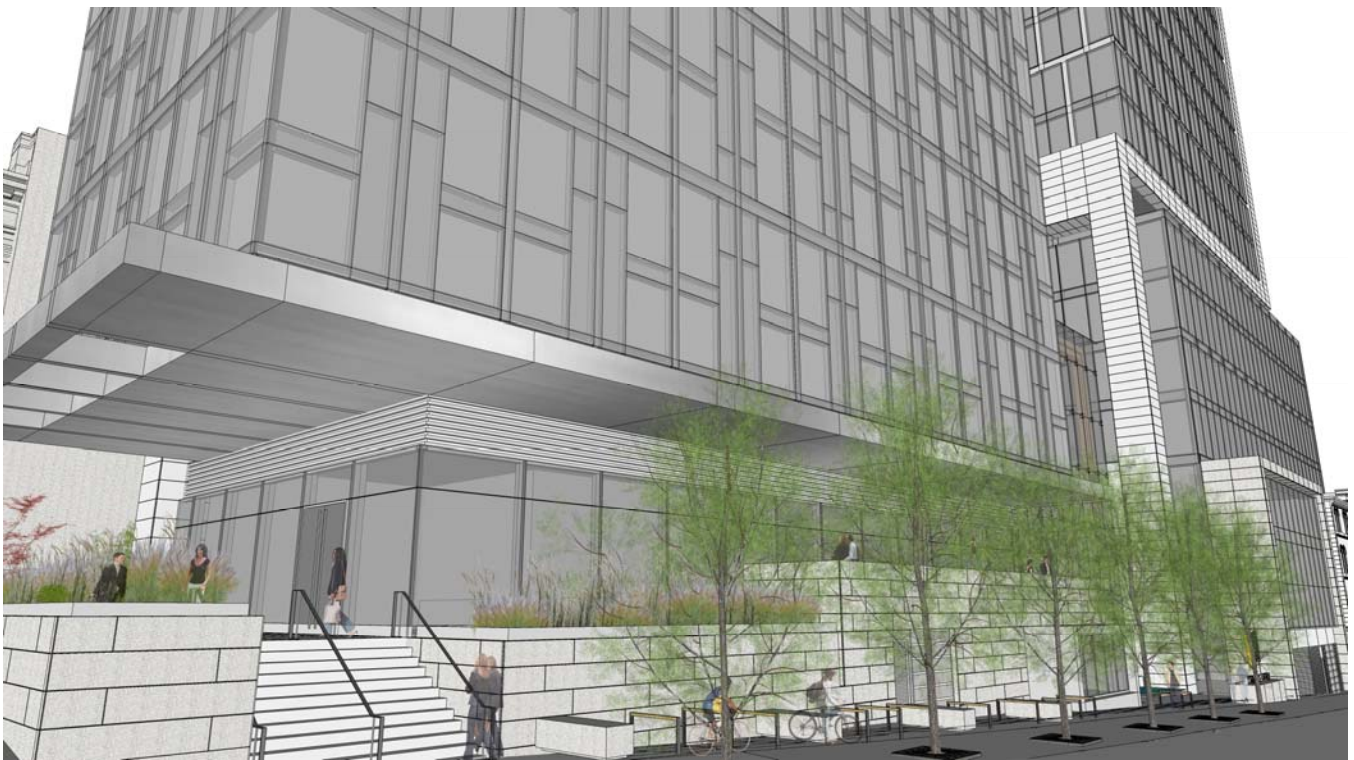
(Revised) Hollis Street facade of the hotel, hotel plaza, terraces and widened sidewalk.
